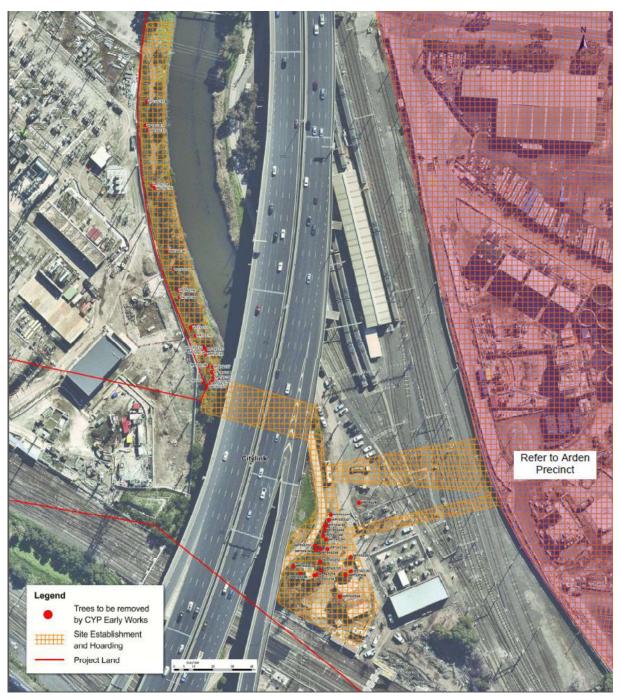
Excerpt from the Site Layout Plan which identifies CYP Early Works within the Intake Substation (refer to Appendix A)
